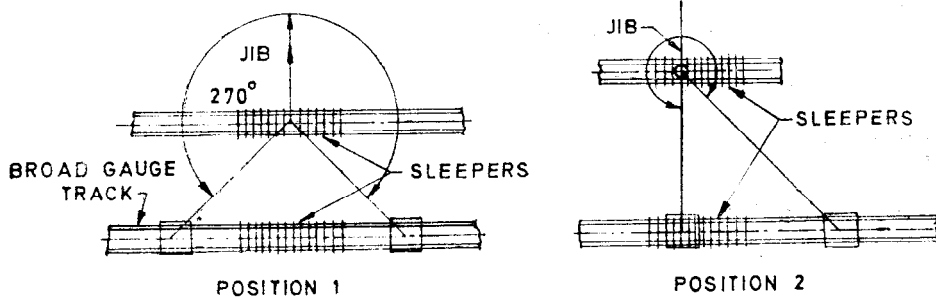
TYPICAL CONCRETING ARRANGEMENT BY CRANES OF BARRAGE SPILLWAY
